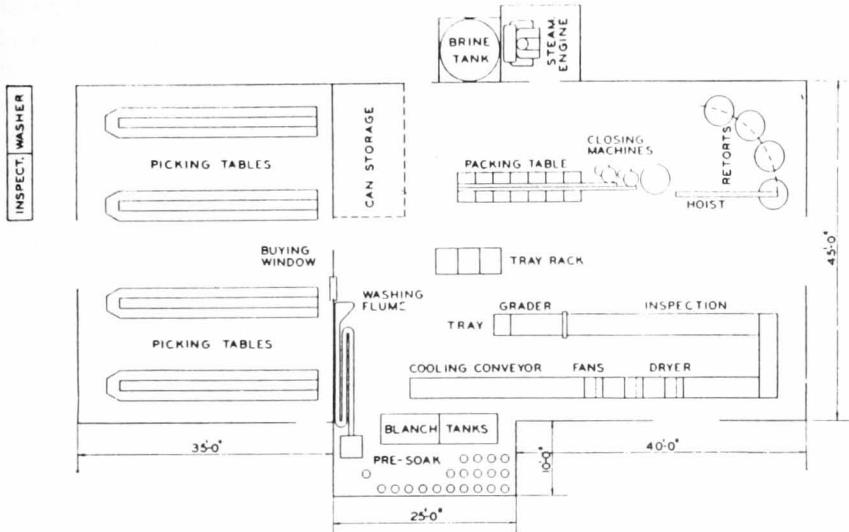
Floor plan of a typical shrimp cannery. (Courtesy, American Can Company.)
